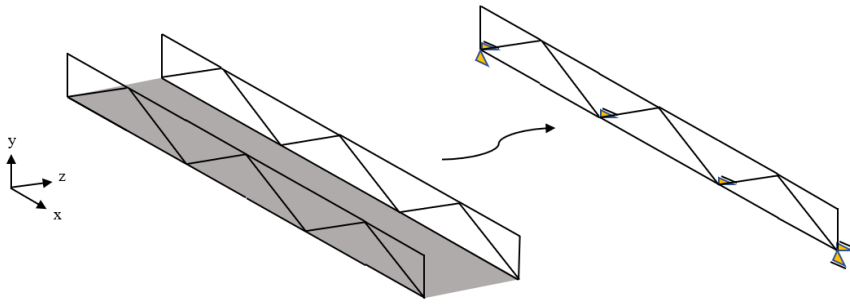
The structural model approximation of a steel-truss pedestrian bridge
